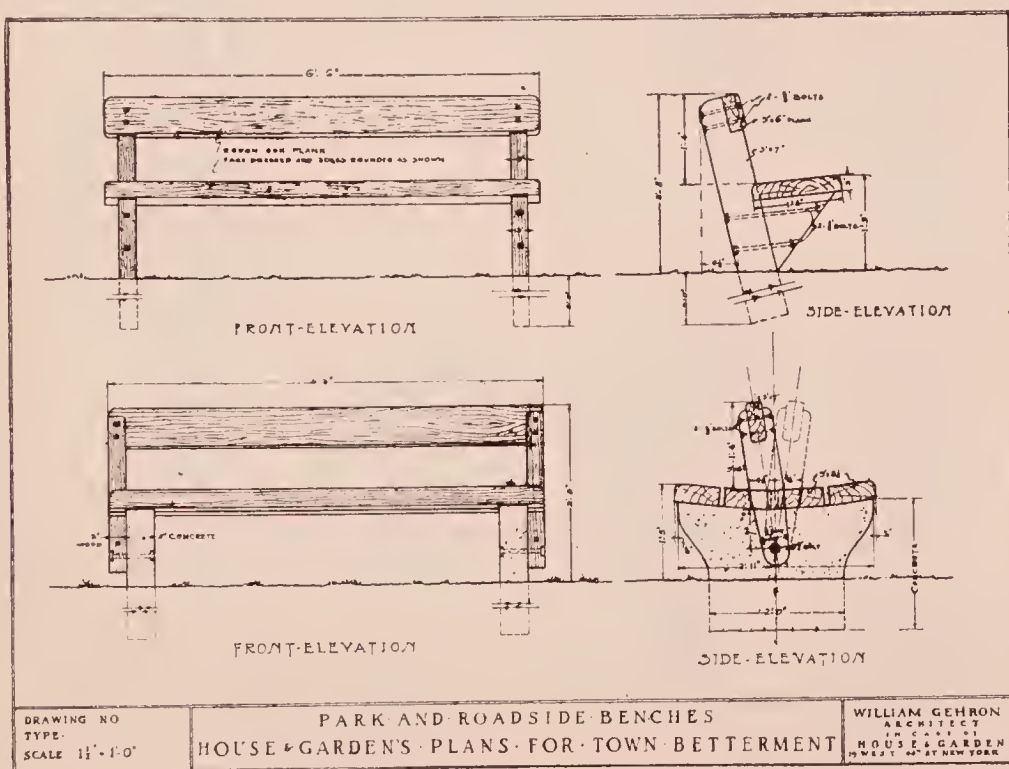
A drawing from "The House and Garden" magazine which suggested the standard sheet form used in this text.
